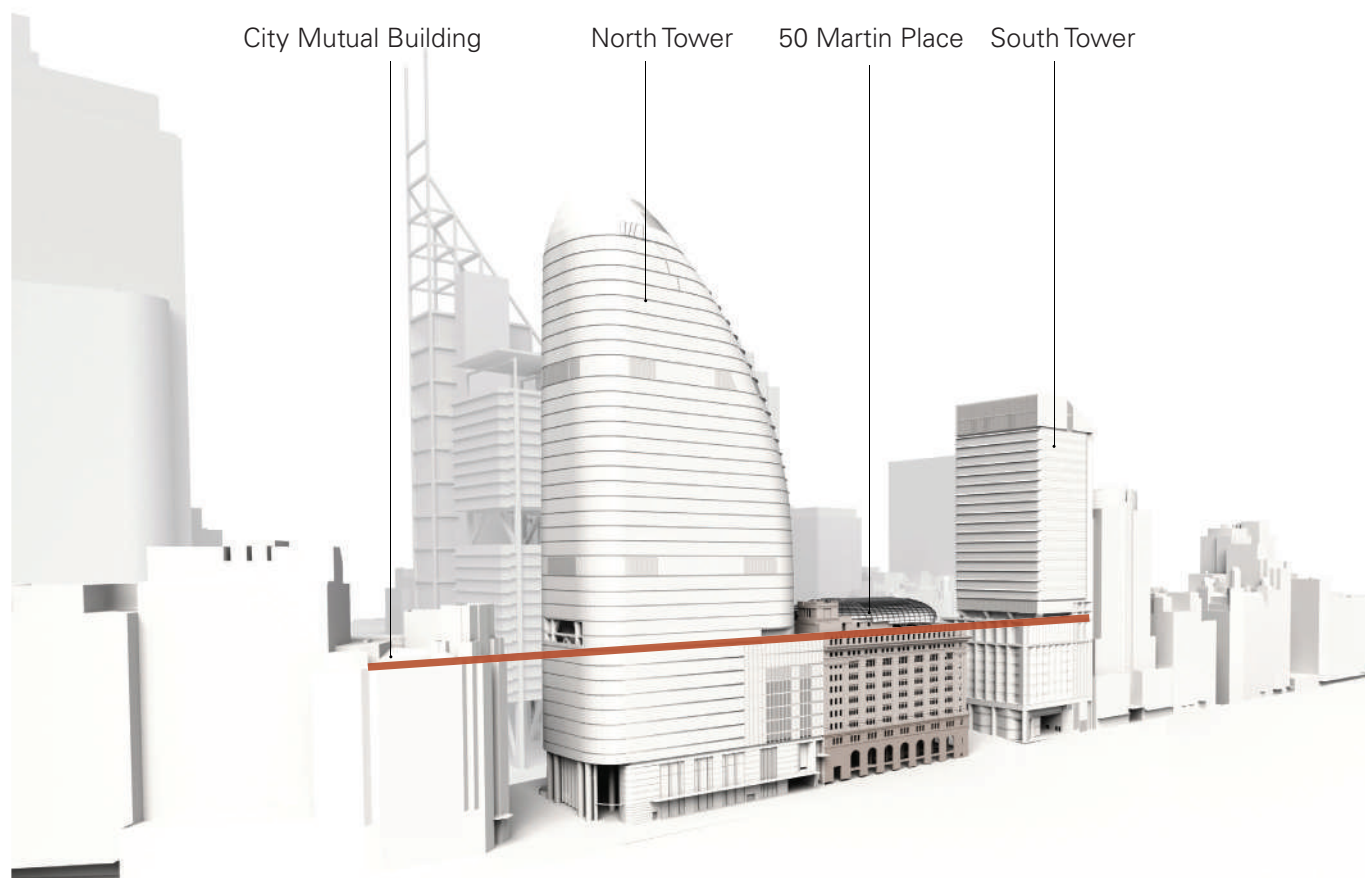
Castlereagh Street- Reinforcing key street frontage podium heights of surrounding buildings
